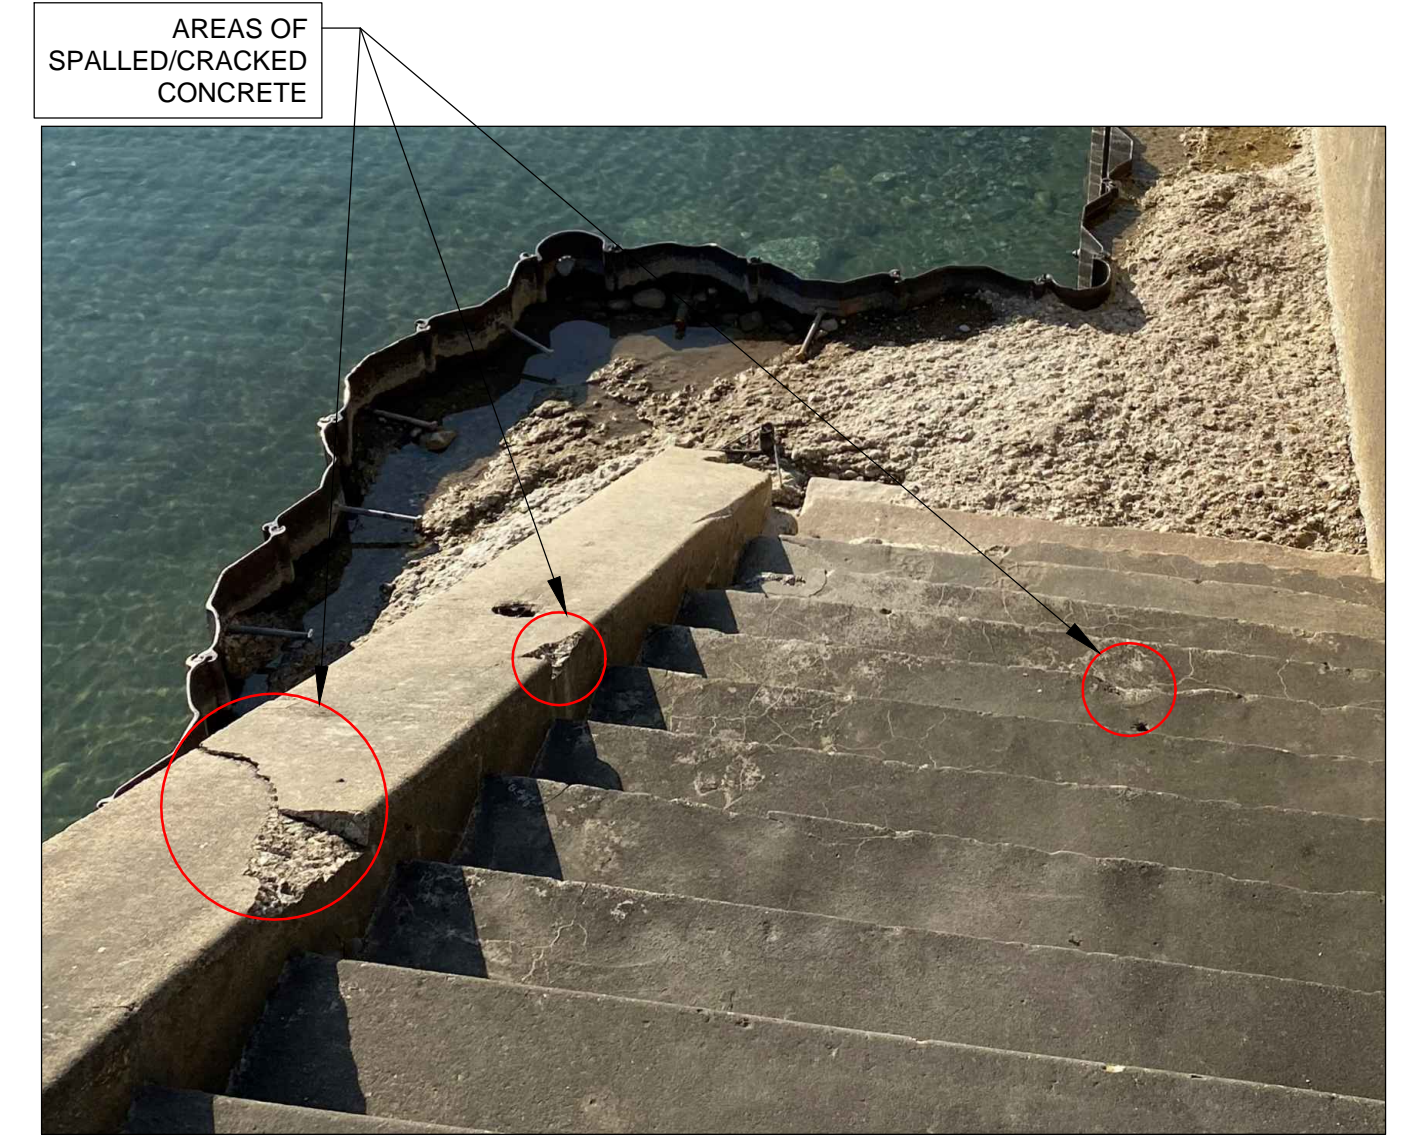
LOOKING SOUTHEAST AT SPALLED/CRACKED CONCRETE STAIRS AND STEEL SHEET PILE CAP.
